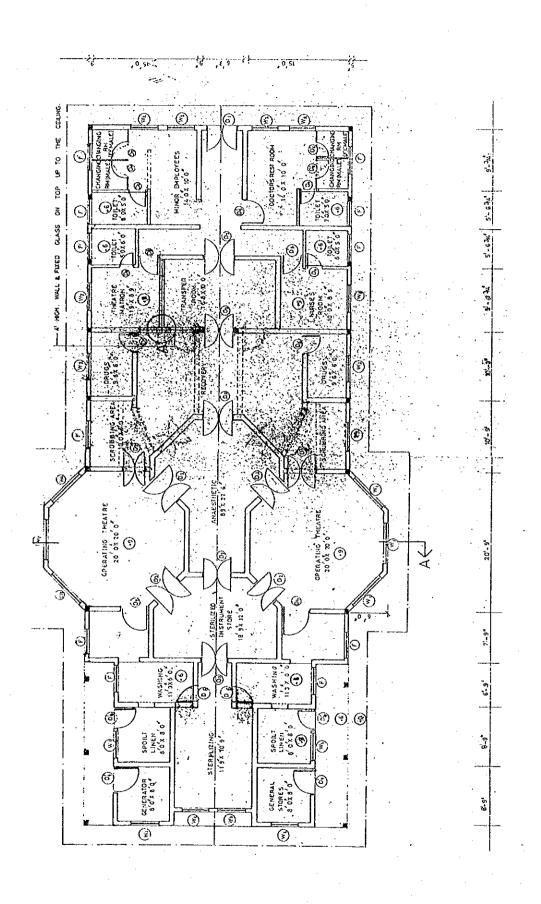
MODIFICATION PLAN : OLD O.P.D. → NEW EMERGENCY UNIT
